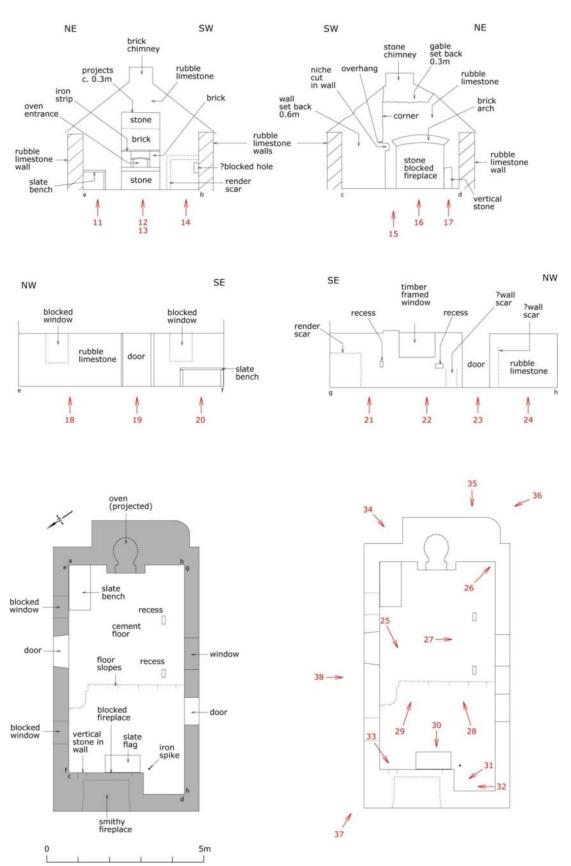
Plans of the internal views of the cottage showing the position of photographs taken during the photo survey.
